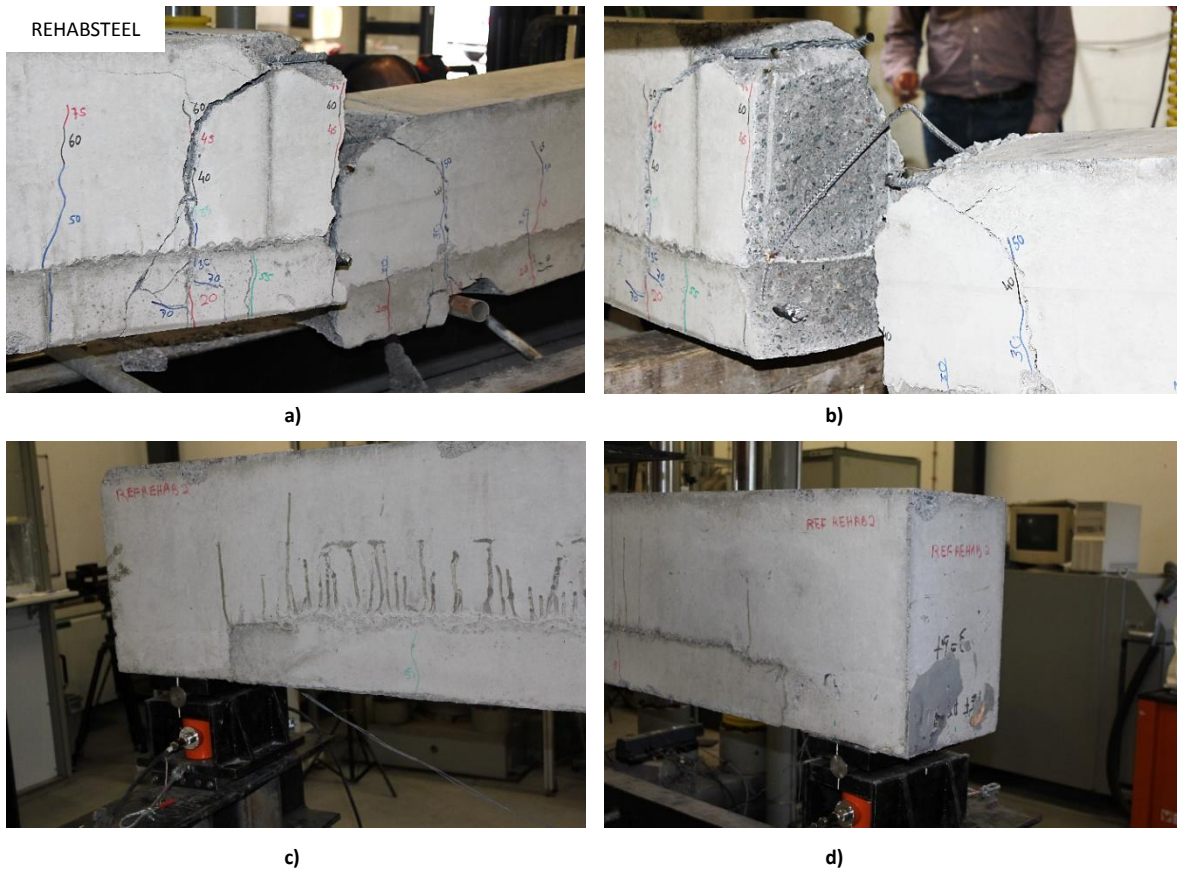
REHABSTEEL beam failure: a) at mid-span; b) mid-span cross section detail; c) left support; d) right support
